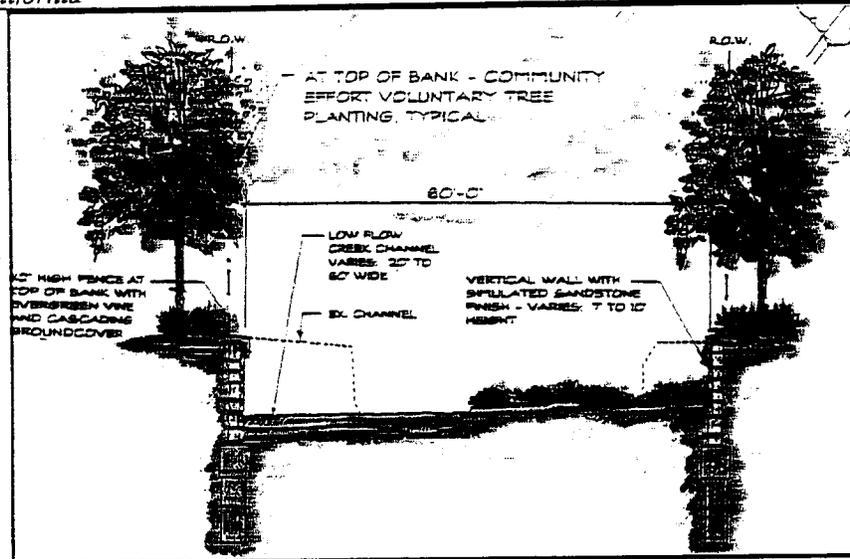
Vertical Wall on Pier Footing Typical Section
